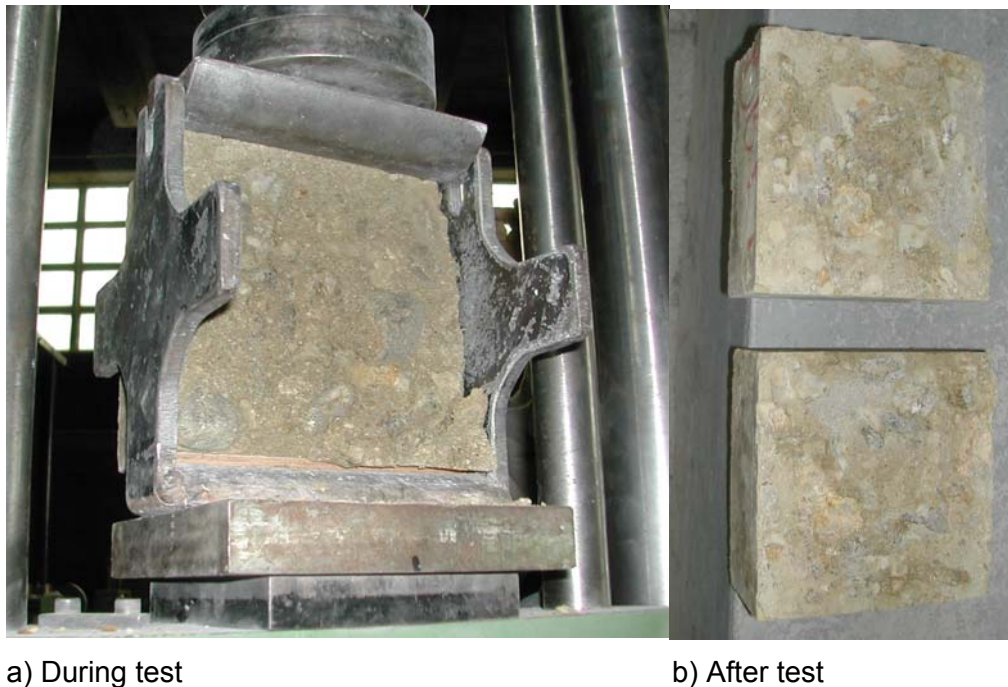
Typical view of specimens used in splitting tensile strength testing
